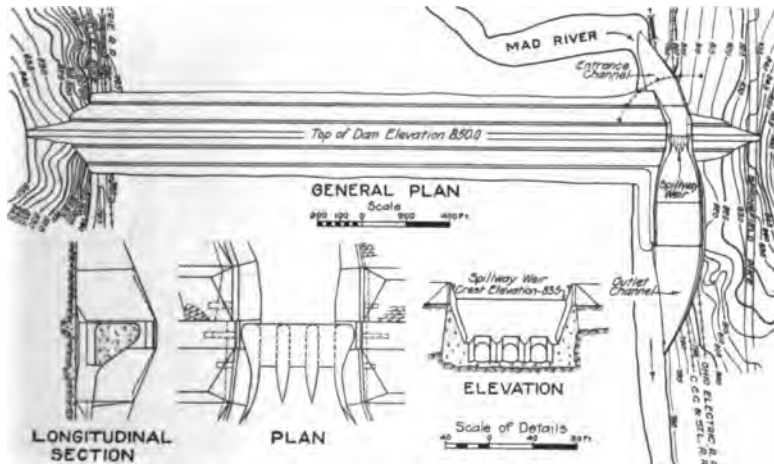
GENERAL PLAN OF HUFFMAN DAM, OUTLET CONDUITS, AND SPILLWAY; AND ENLARGED PLAN, ELEVATION, AND LONGITUDINAL SECTION OF COMBINED CONCRETE SPILLWAY WEIR AND OUTLET WORKS.
